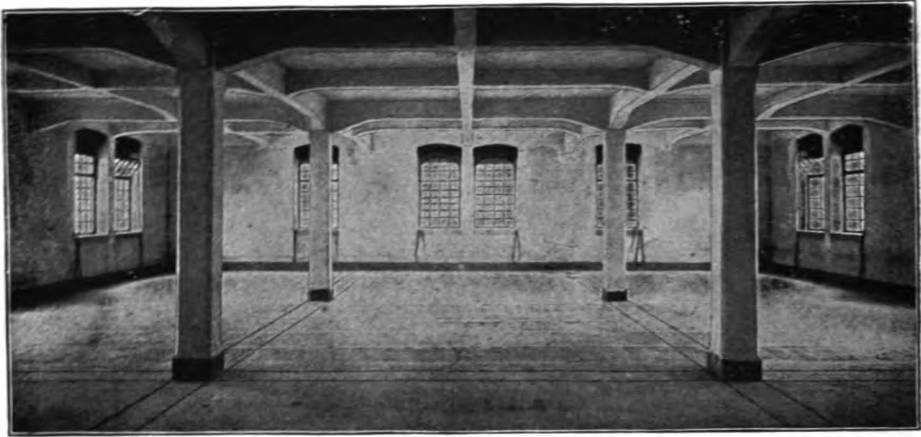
Storehouse in Ulm. Square floor panels and intersecting floor beams.
